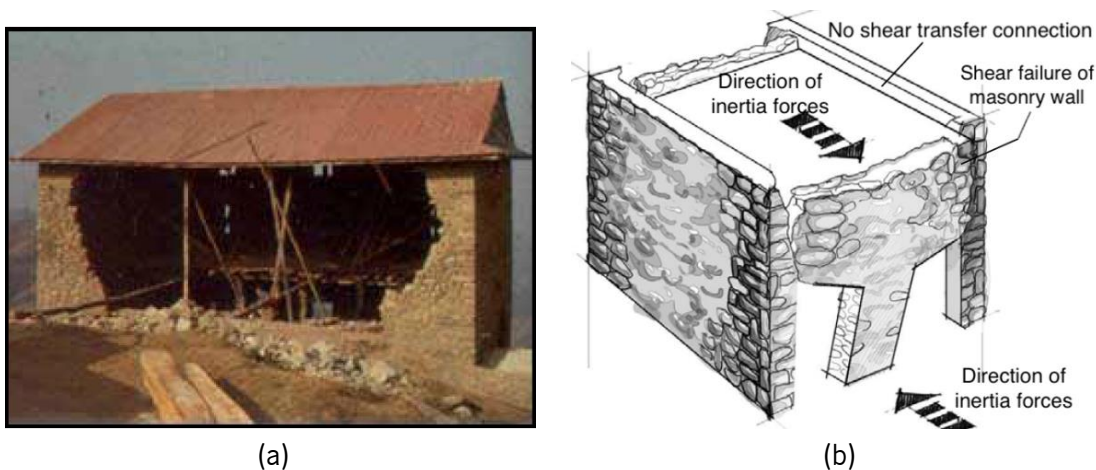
OOP failures of masonry walls due to the lack of wall-to-roof connections (Bothara and Brzev 2011): (a) collapse of a long wall in the 1988 East Nepal earthquake; (b) Inertia forces causing local failure mechanism.
